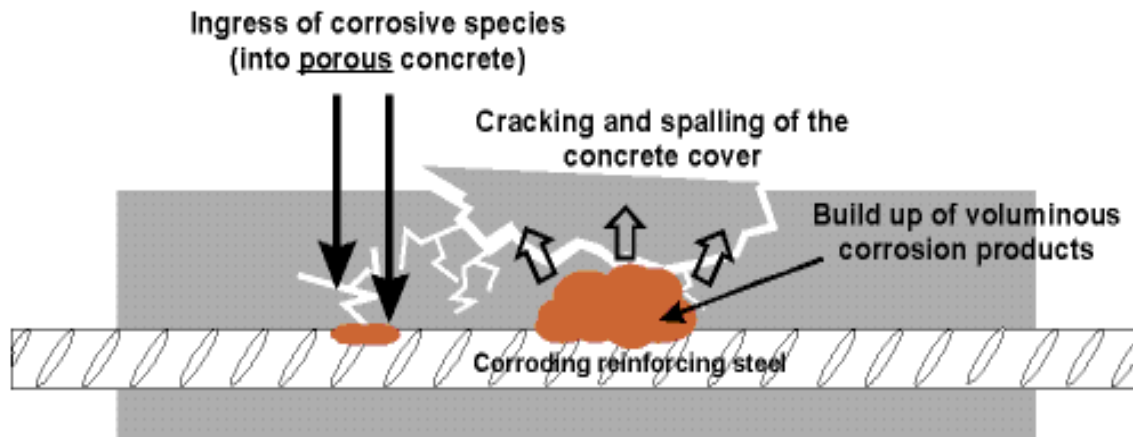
Cracking and spalling of concrete induced by reinforcement corrosion (Zhou et al., 2015)
